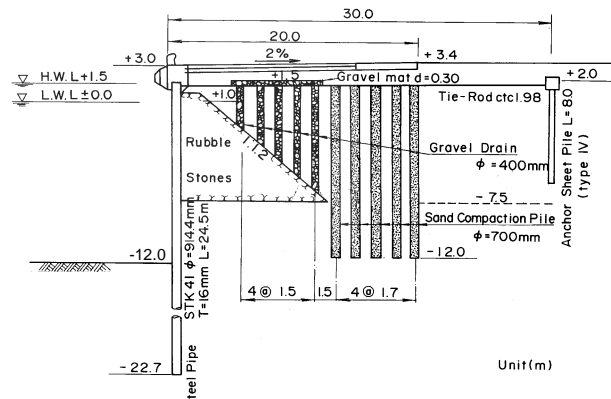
Undamaged sheet pile quay wall at South West Port No.1 Wharf, Kushiro Port, during 1993 Kushiro-oki earthquake [5]
